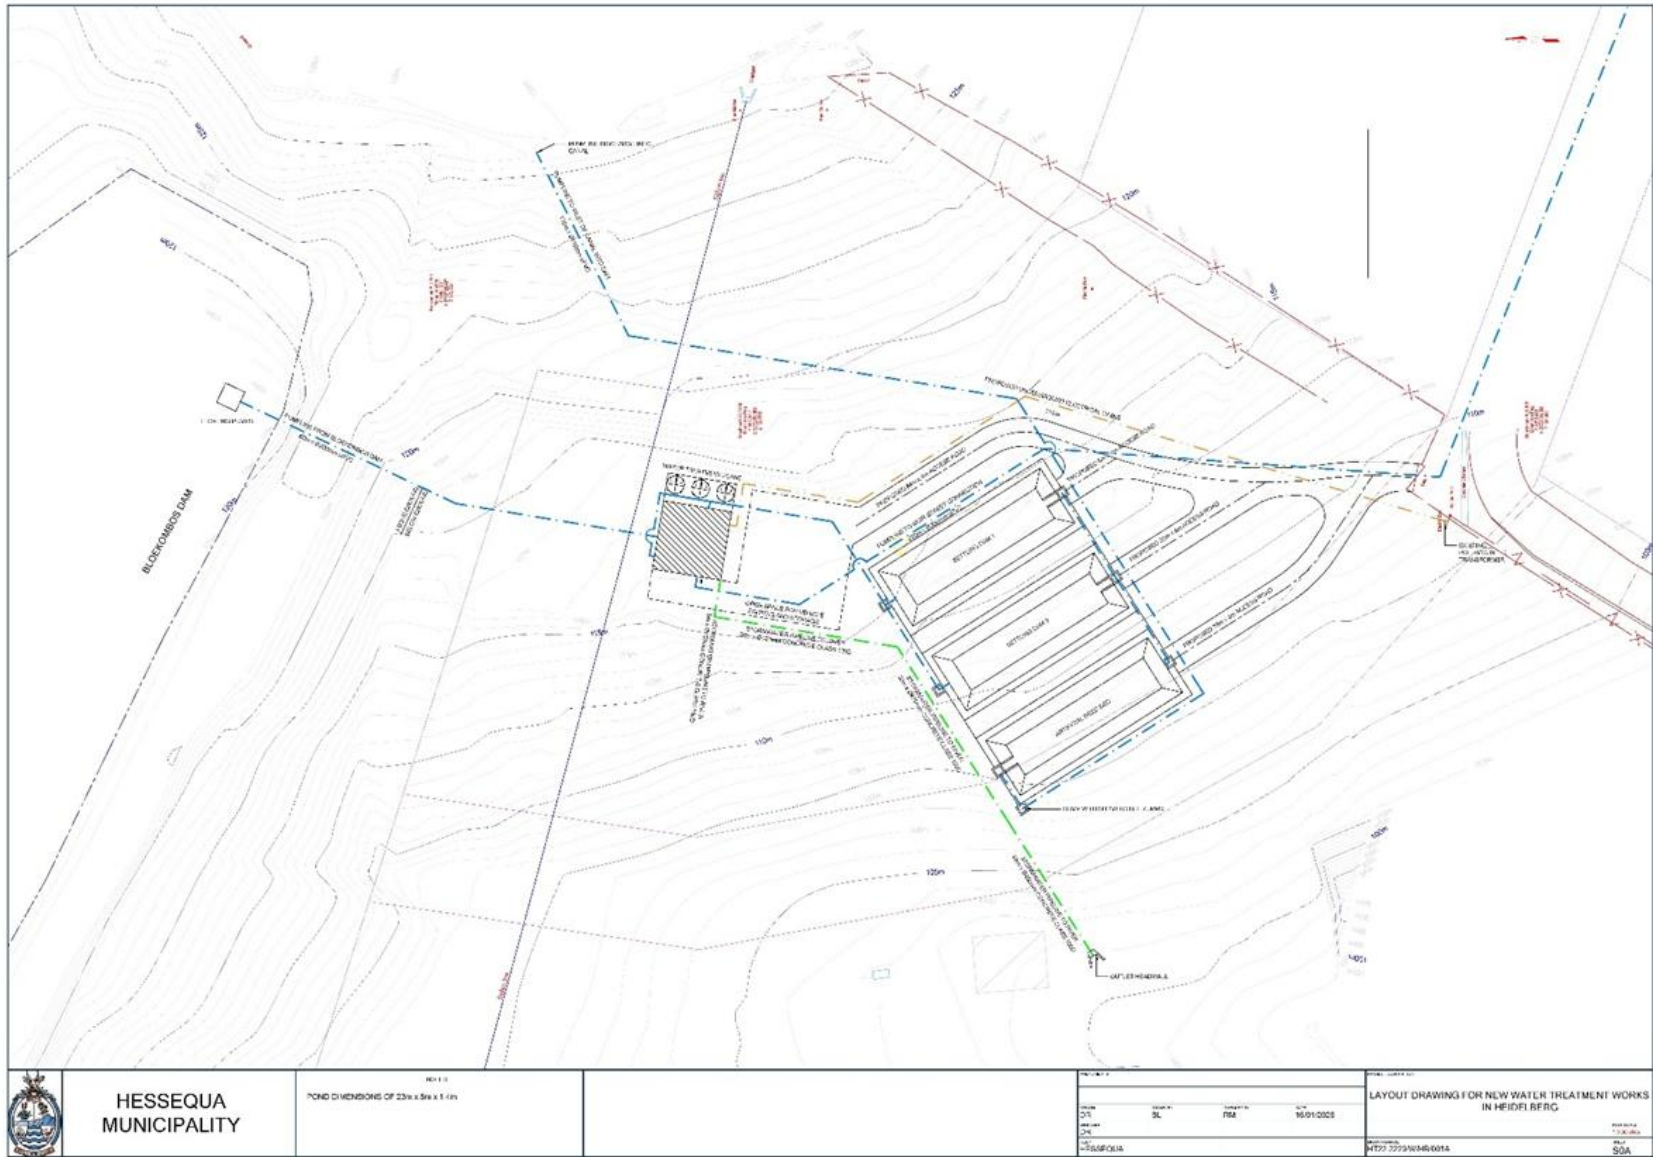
Proposed Heidelberg Water Treatment Works Layout
